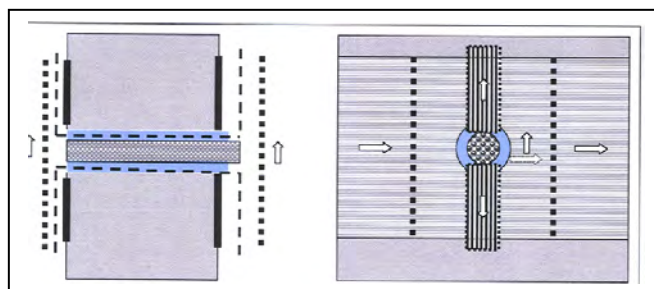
Ardfix connecting the two faces of a wall. Loads are transferred through a net work structure.
